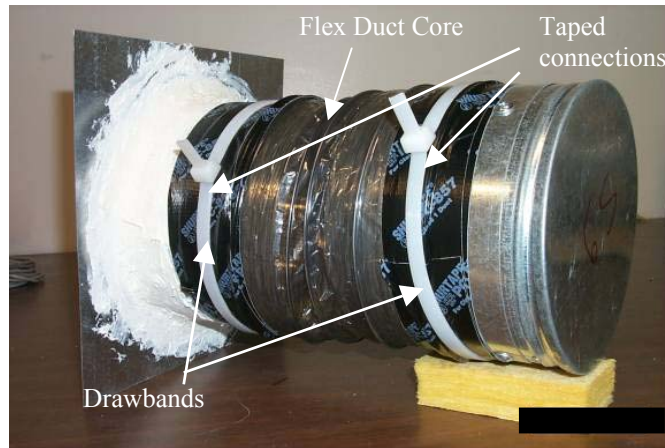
Example of a core-to-collar test sample showing the two taped connections and the mechanical clamps.
